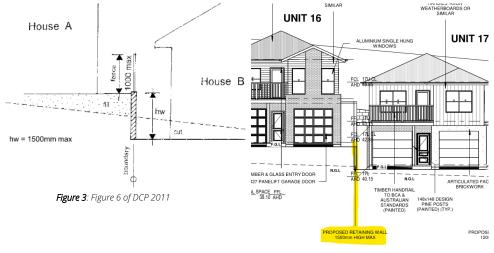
maximum proposed retaining (source: agcad 27/08/2024
